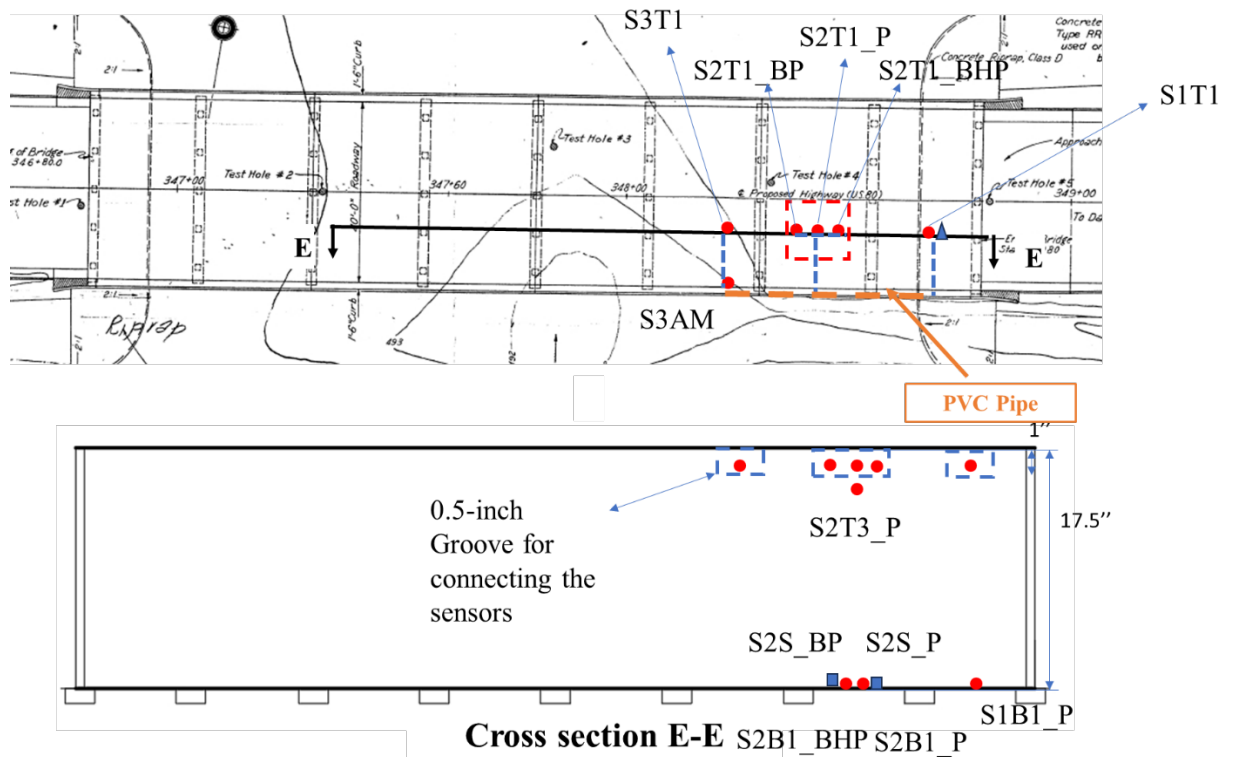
Plan view and cross-section view of temperature sensors for the bridge deck.
